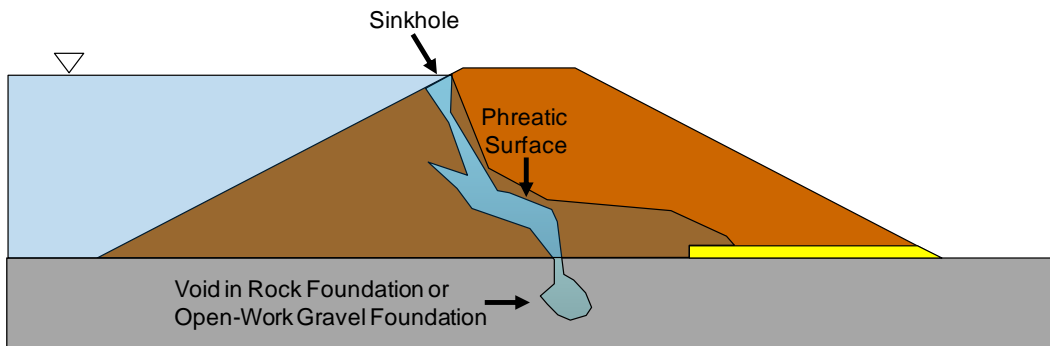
Internal Erosion of the Embankment into the Foundation
